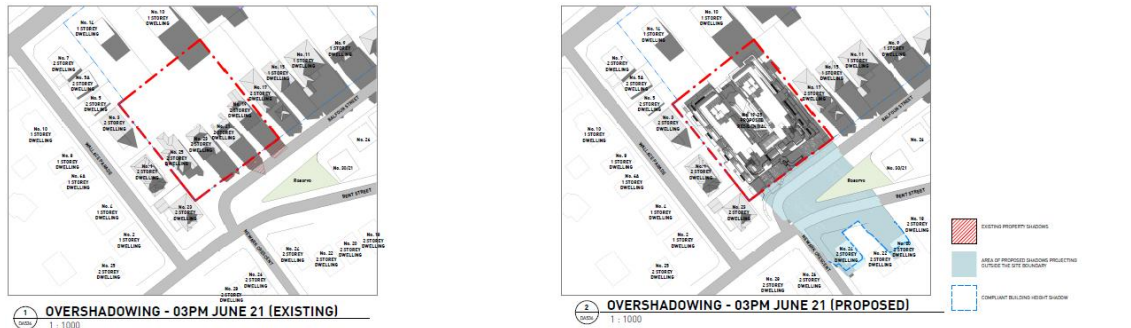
Proposed overshadowing (Source: Giles Tribe)
